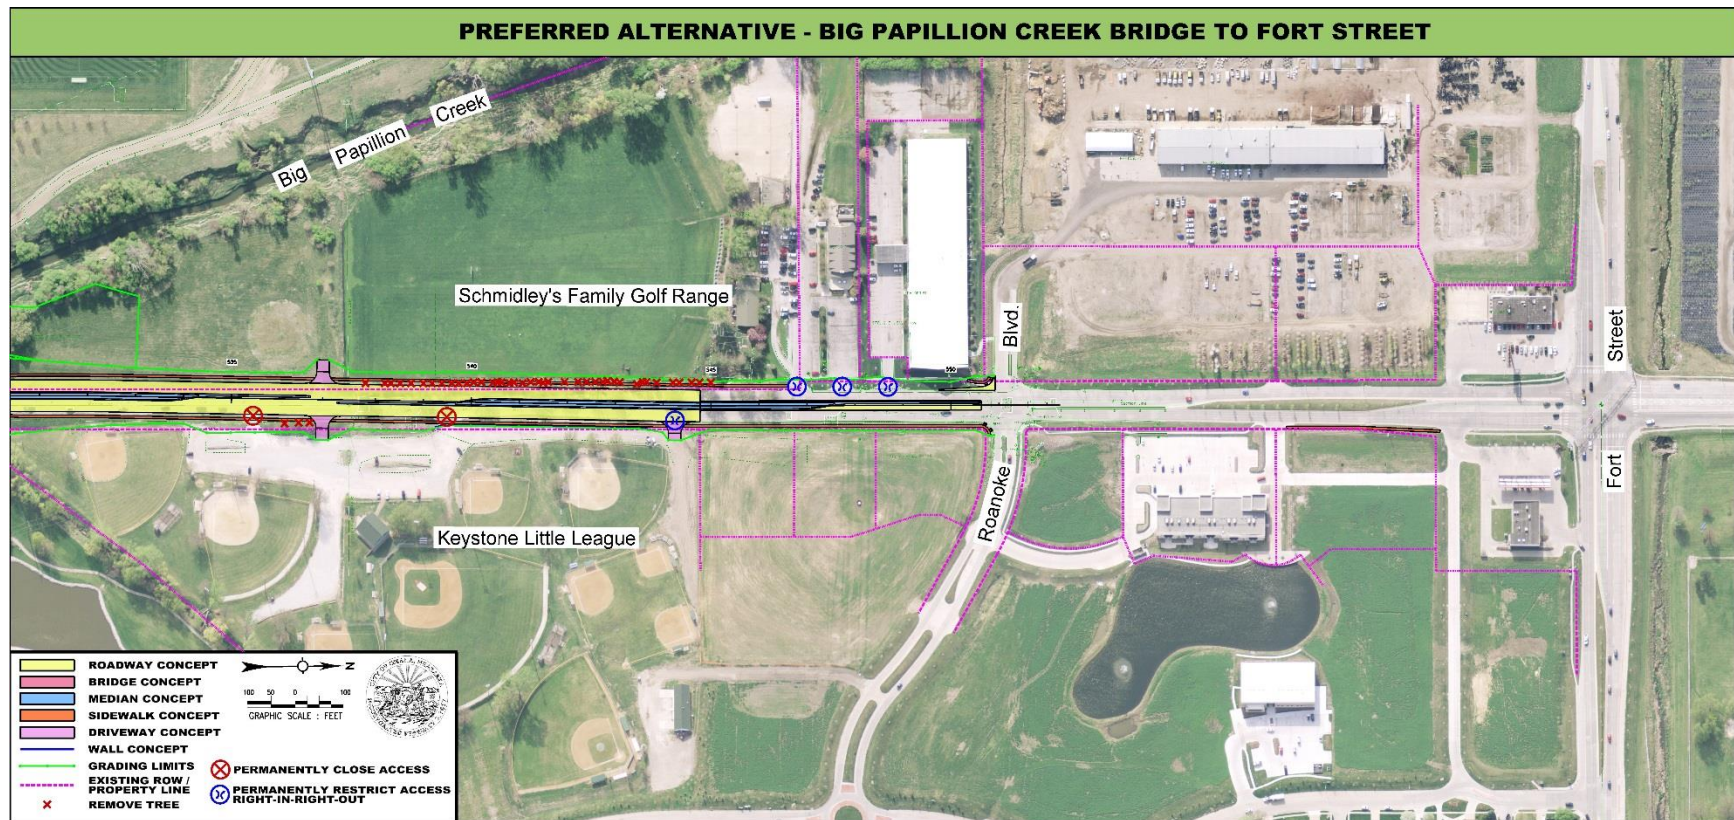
C. Preferred Alternative – Big Papillion Creek Bridge to Fort Street
